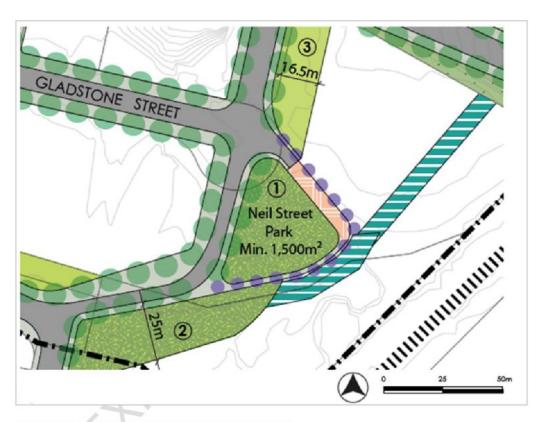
Neil Street Park, Canal Park and Boulevard Park
